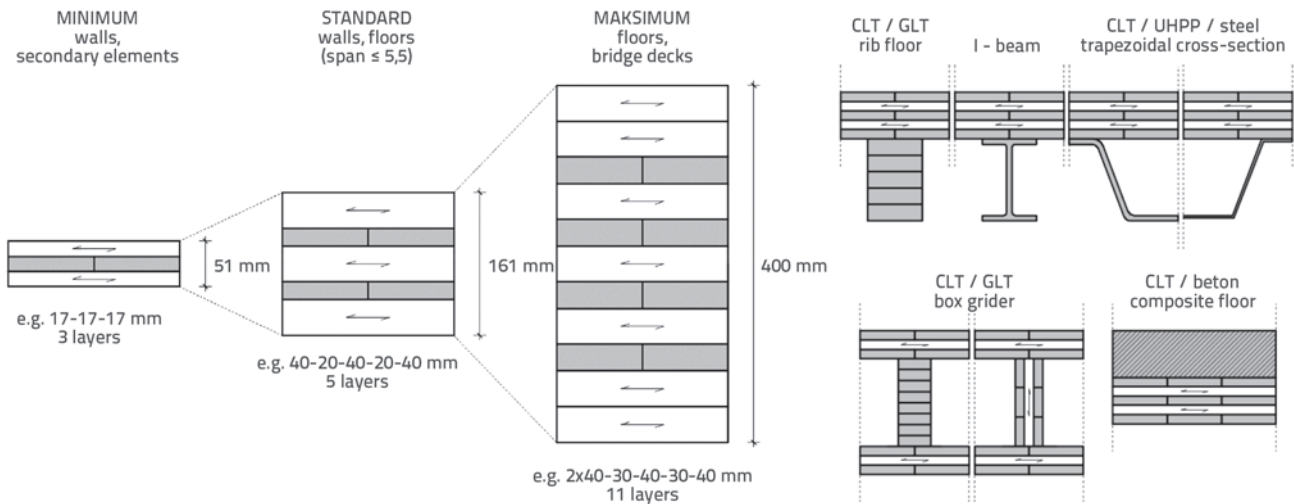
Cross sections of typical CLT girders (left); examples of composite structures based on CLT, LLD, steel, concrete or ultra-high-performance plywood (UHPP) (right) [14]
